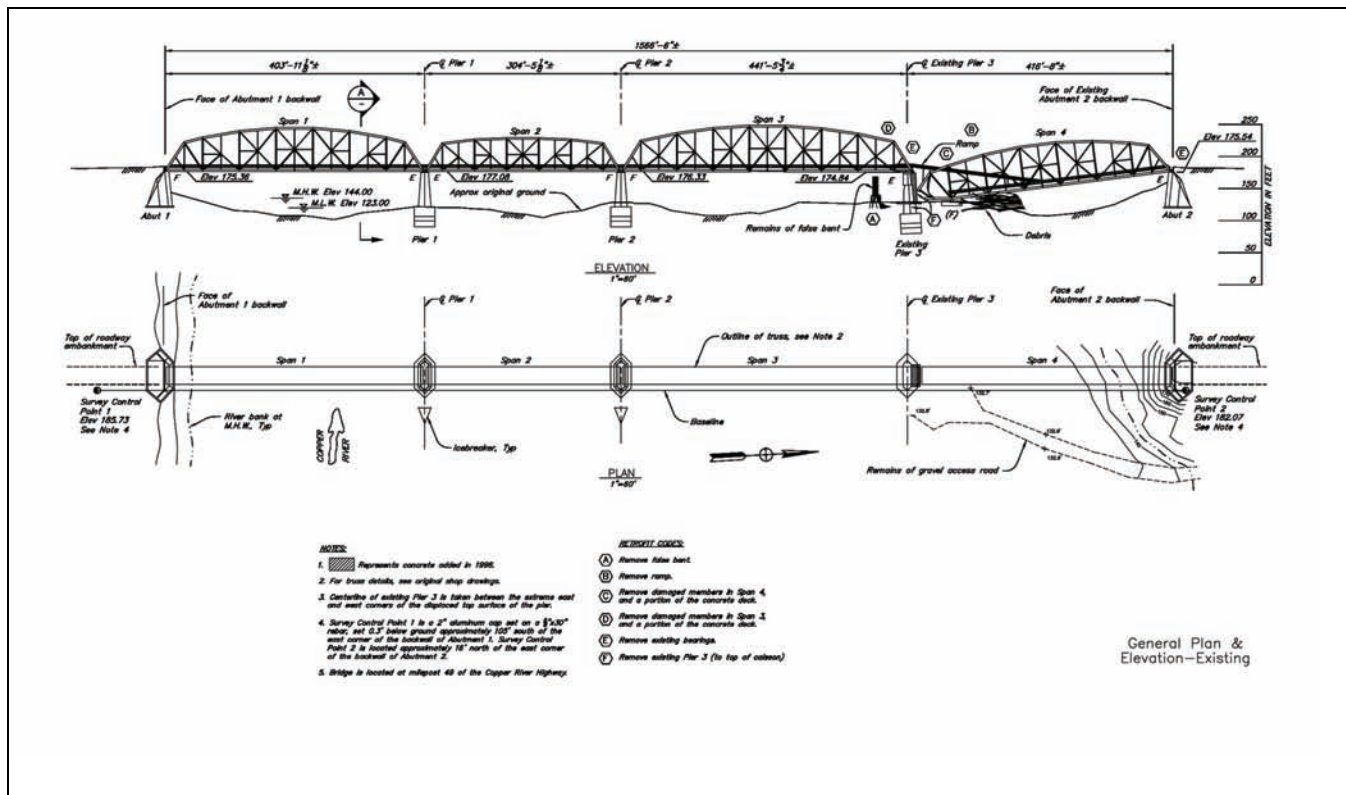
Million Dollar Bridge, Copper River, Alaska
